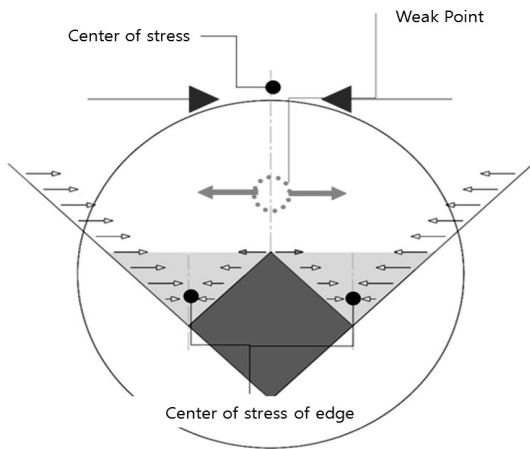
Causes of the crack at the edge of concrete slab (Detail 'A' of Figure 7)
